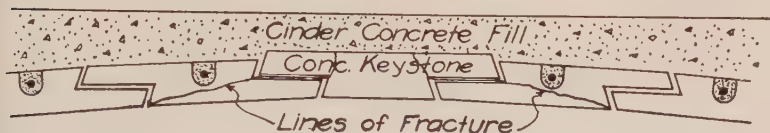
SKETCH SHOWING MANNER OF FAILURE AT CENTER UNDER IMPACT.
